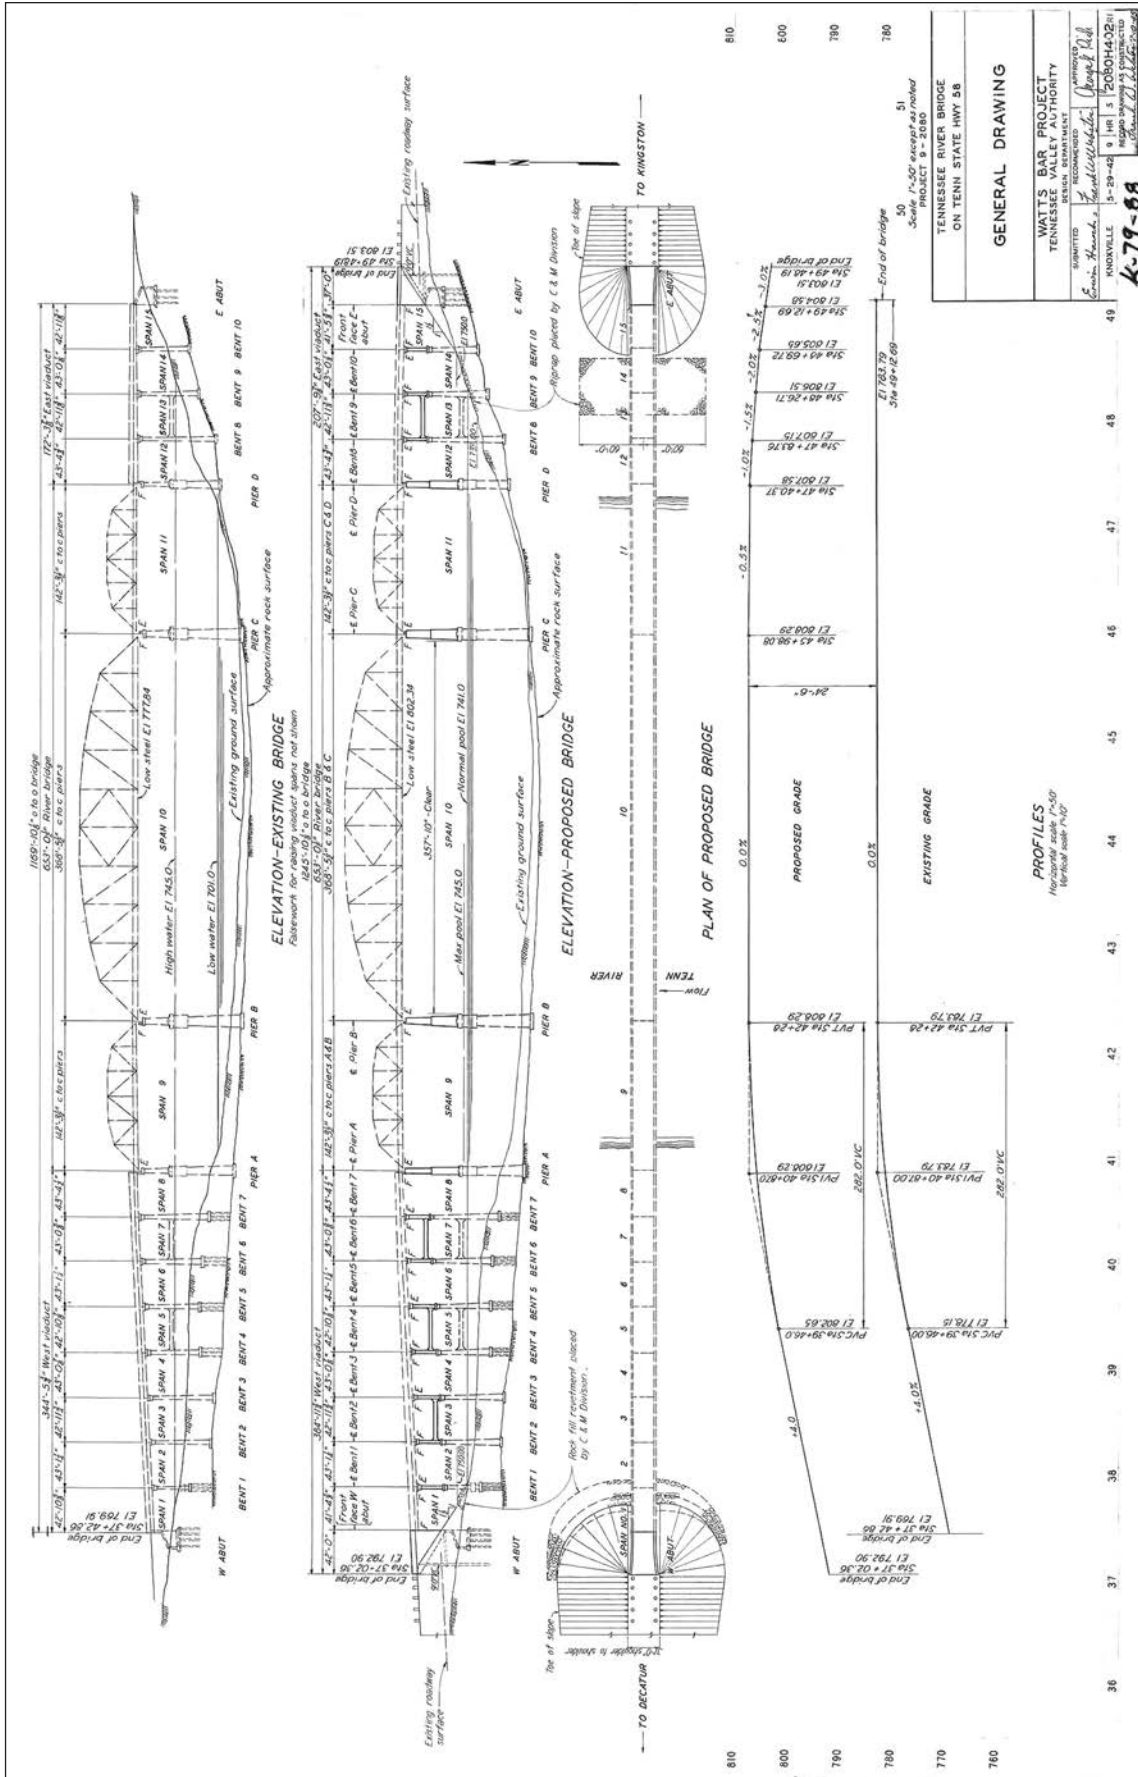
Drawing, West Approach, Calvin J. Ward Bridge, 1942
